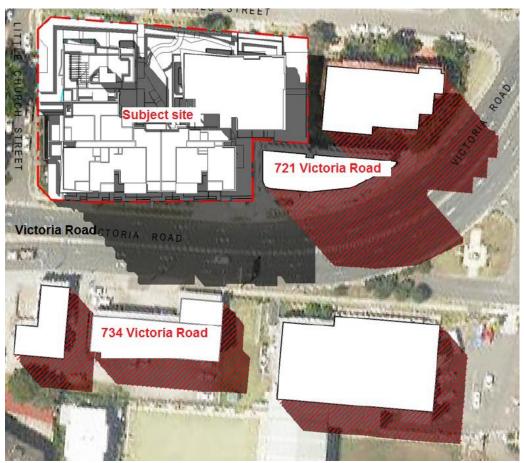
Overshadowing at 12 noon– some overshadowing to the north west corner of 721 Victoria Road.
